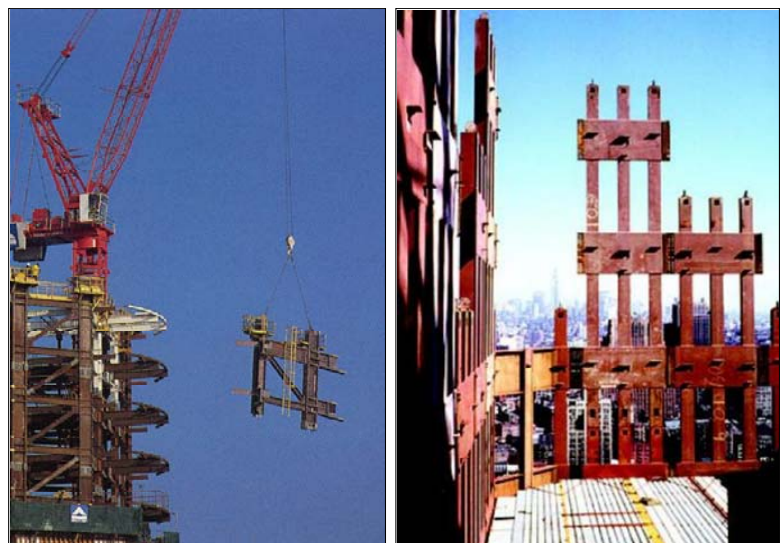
(a) Construction of Commerzbank Tower, Frankfurt (Davies & Lambot, 1997, p. 115); (b) Panels in World Trade Center, New York (Source: 911review.org)
